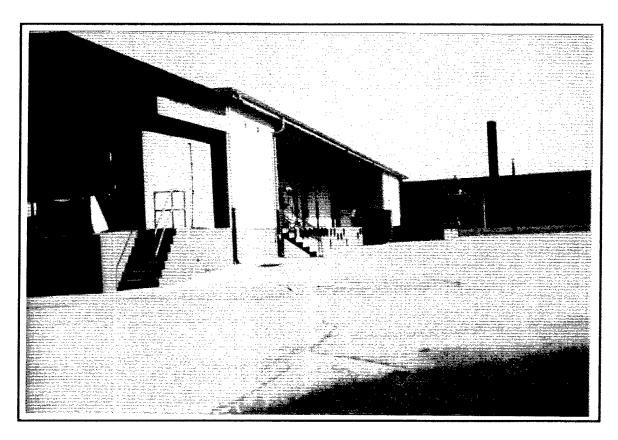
Loading Dock on West side of Building 5202 showing North Freezer
